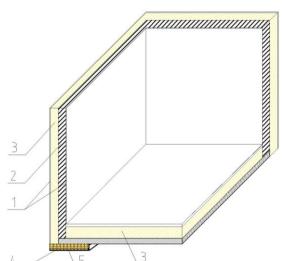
Option 3 of insulation joint between the wall and basement floor.
